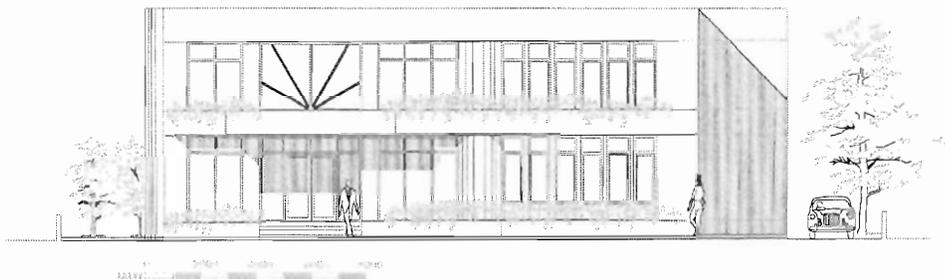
Example Kingston Small Office Building -- Front Elevation (View from the SE)
